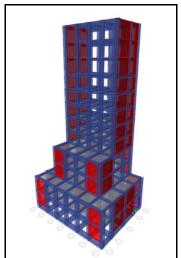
Isometric View for Model 1 with Shear wall Area to Floor Area Ratio 0.5
